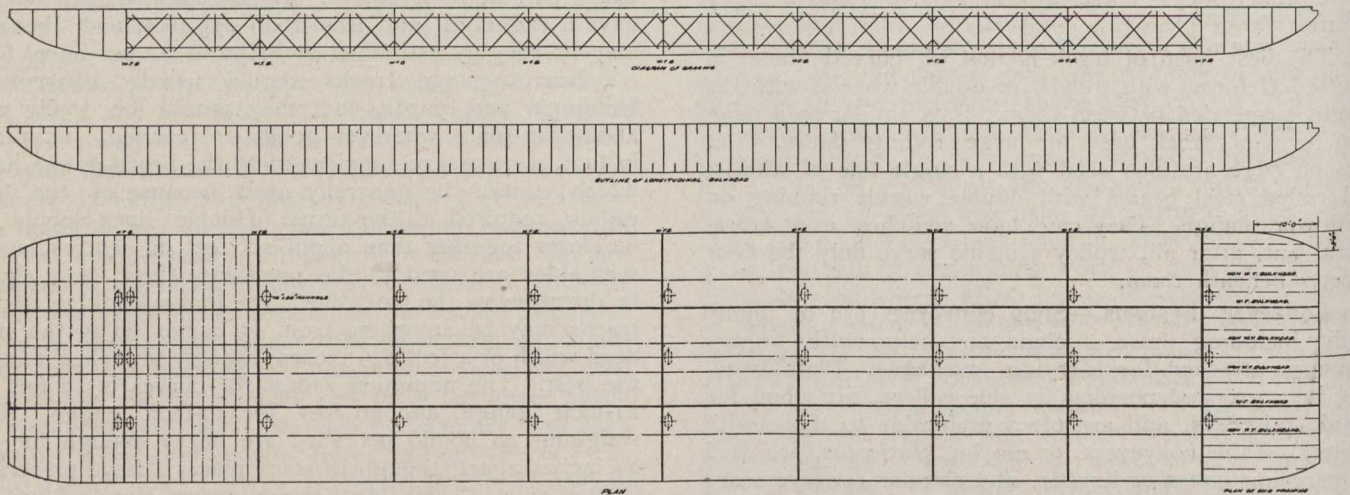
Plan and Sections of C.P.R. Transfer Barge.
